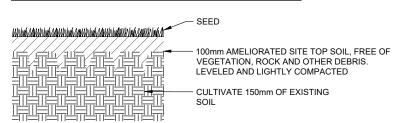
TYPICAL PLANTING DETAIL (NTS) Areas of Jute matting do not require mulch
